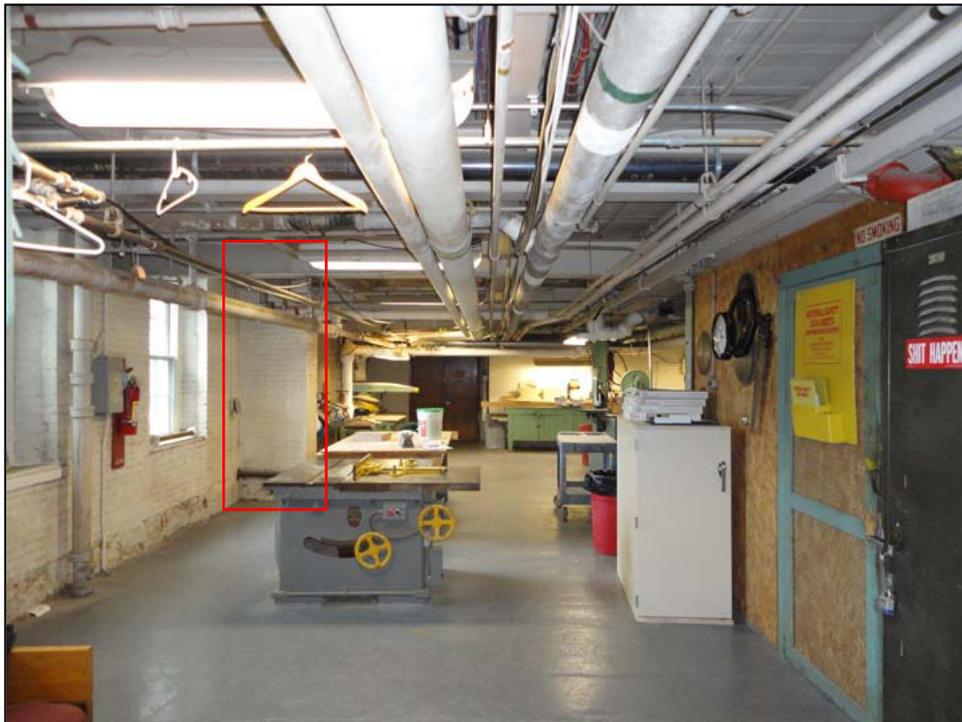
Building 27 basement, Room 012, looking east, partial brick wall (former end wall) on north side of room indicated by red outline, and doorway to Room 015 in background, 2010.
